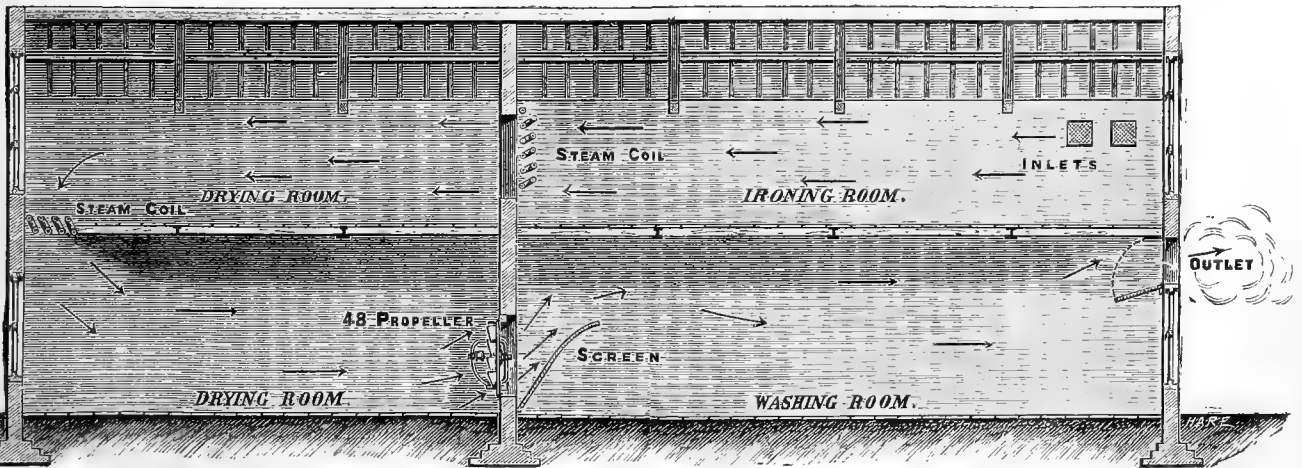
AIR PROPELLER USED FOR COOLING, DRYING, AND VENTILATING IN A STEAM LAUNDRY.
